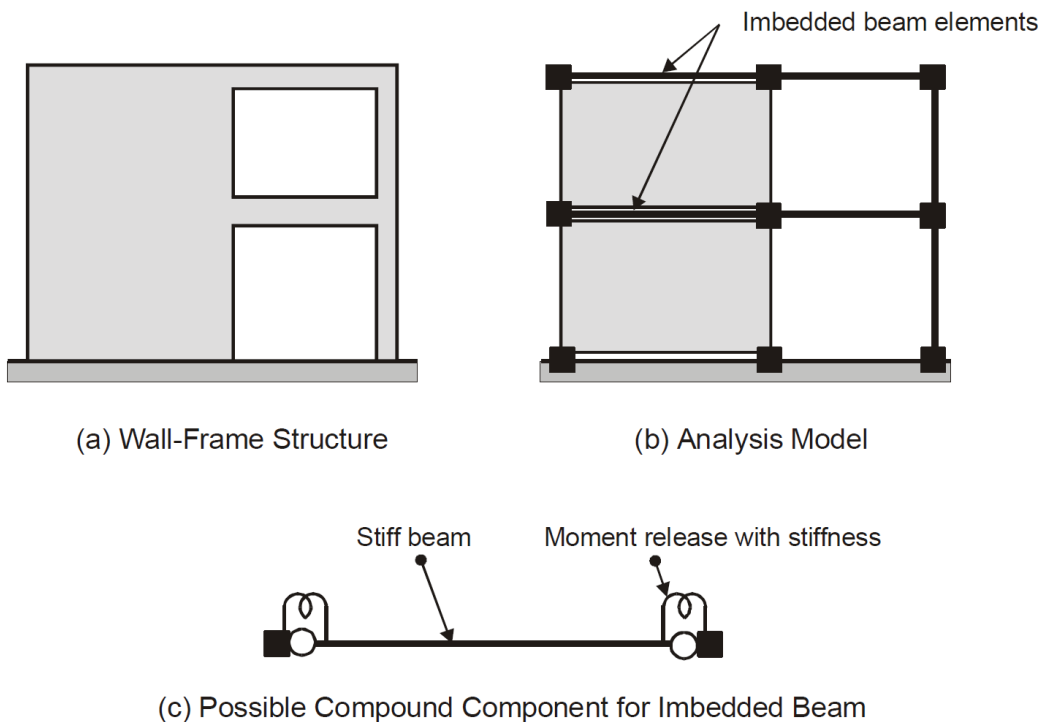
Imbedded element for coupling beam/slab-wall connection (after CSI, 2011)
